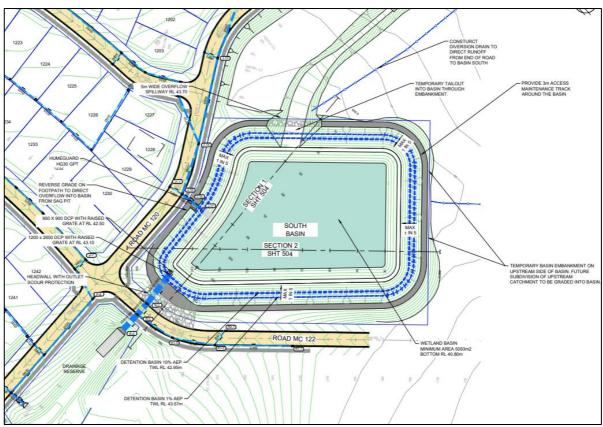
Extract of Proposed South Basin (Source, BRS: 2024)
